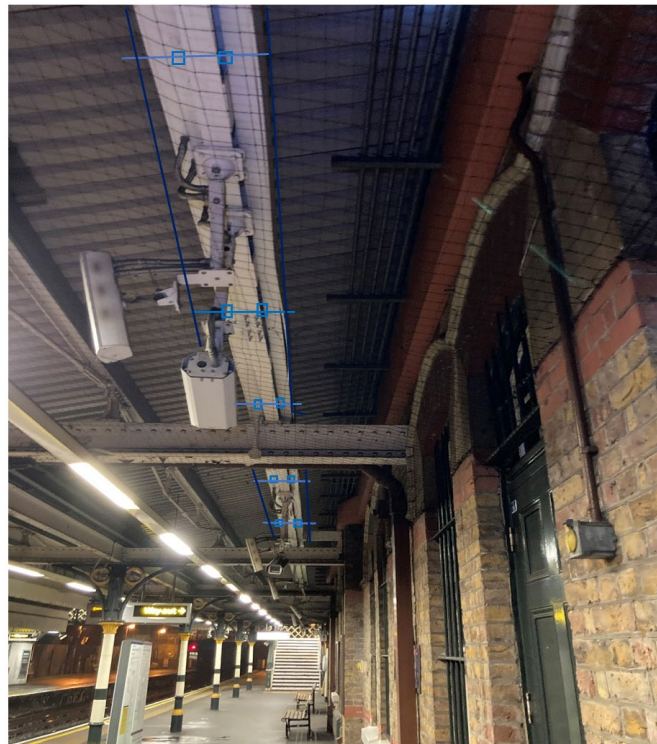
OTC – Access Point (AP) box location Platform 2 Headwall
